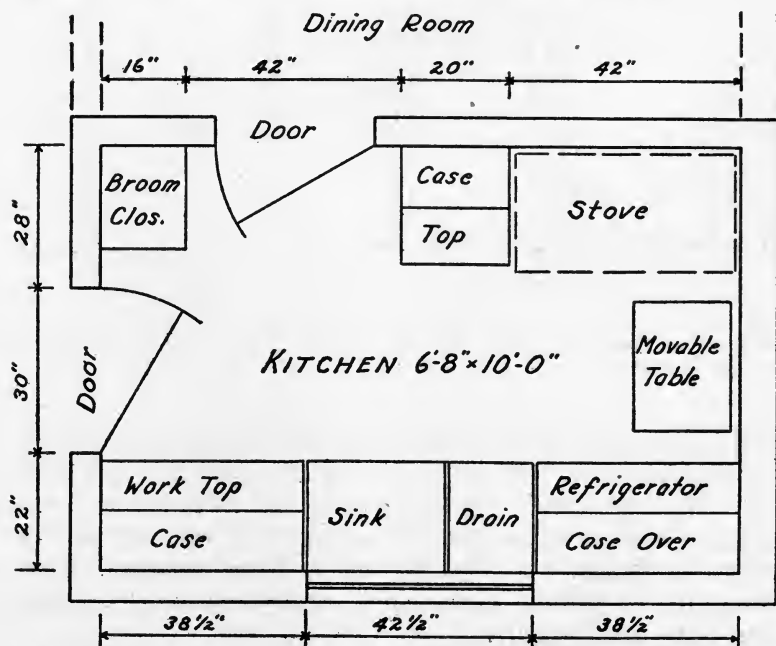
Kitchen plan illustrating the use of standard units. Storage units include single base, single wall case, broom closet, high case over broom closet, double base section, double wall section, supply case over refrigerator and low movable table. Adapted from plan by Deane G. Carter.
